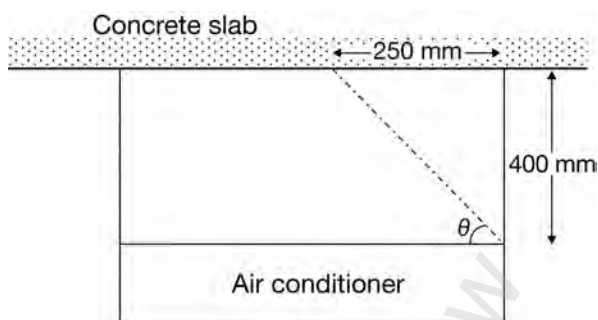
Bracing layout for air conditioner suspended 400 mm below concrete slab
